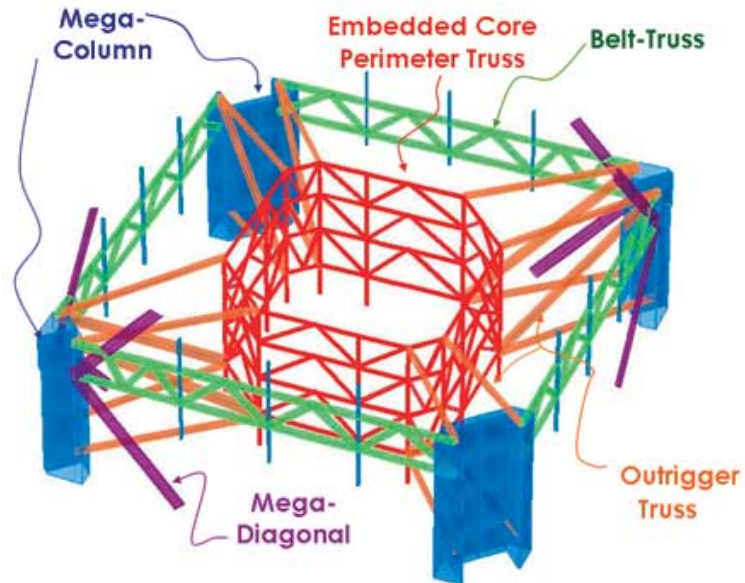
Shanghai WFC structural system - core, megacolumns, outrigger truss, belt truss, and megadiagonal (Katz et al. 2008)
